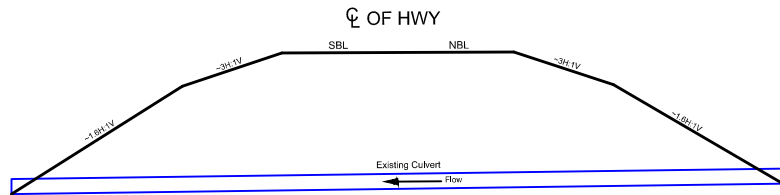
STAGE CONSTRUCTION BY GRADE LOWERING
